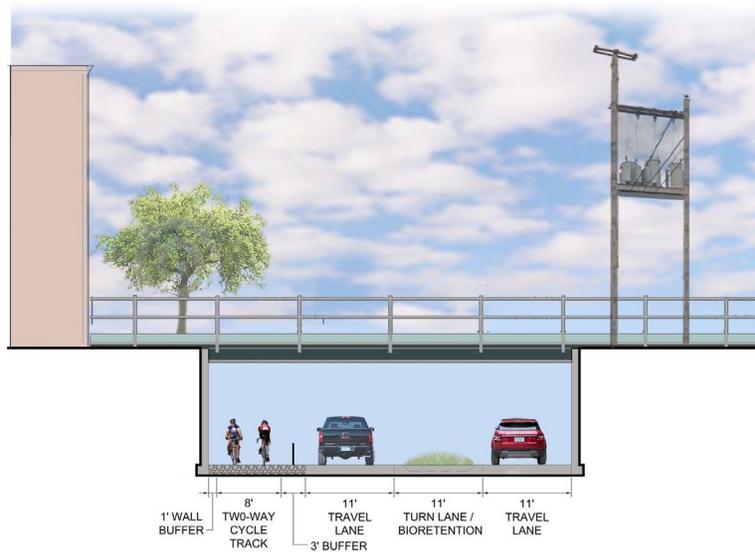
20th Street Underpass (8th Avenue to 7th Avenue)
